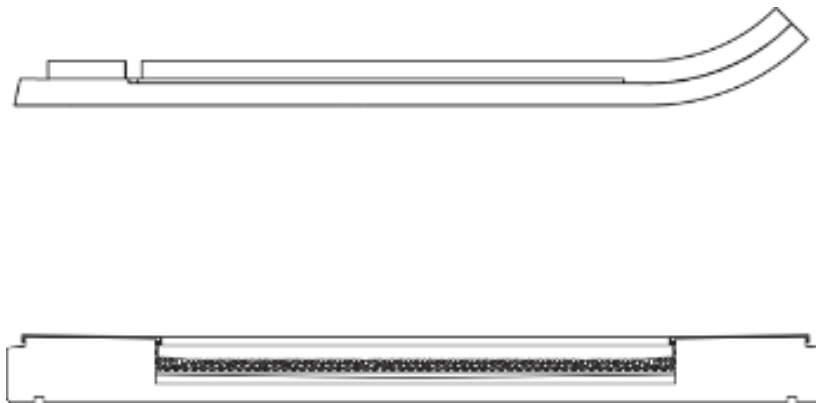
Section drawings of two common-use eave types in the campus with different drainage systems and forms; E Block Entrance eave at the Faculty of Architecture building (above) and L shape eave of the east arcade in the School of Mathematics building (below). (Produced by the author)
